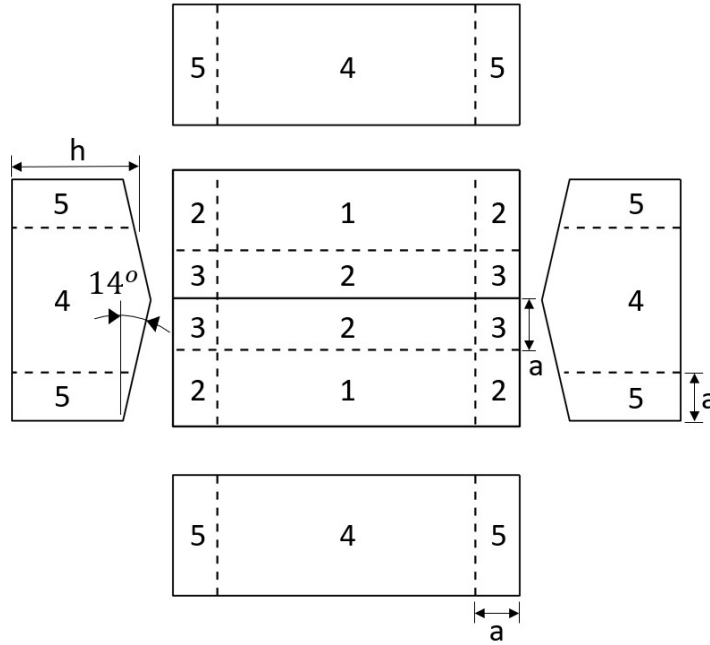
Component and cladding pressure coefficient zones provided by Figures 30.3-1 and 30.3-2B in ASCE 7-22 for a low rise, gable roof building with a roof slope between 7° and 20°.
